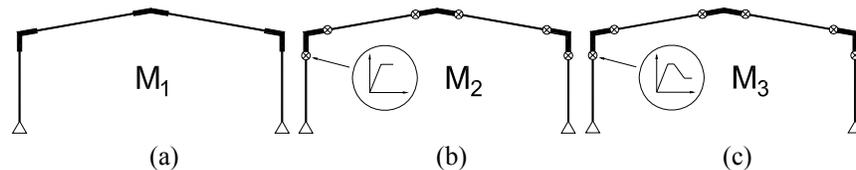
Considered structural models: rigid connections - M1 (a), elastic-perfectly plastic connections - M2 (b), and degrading connections – M3 (c).
